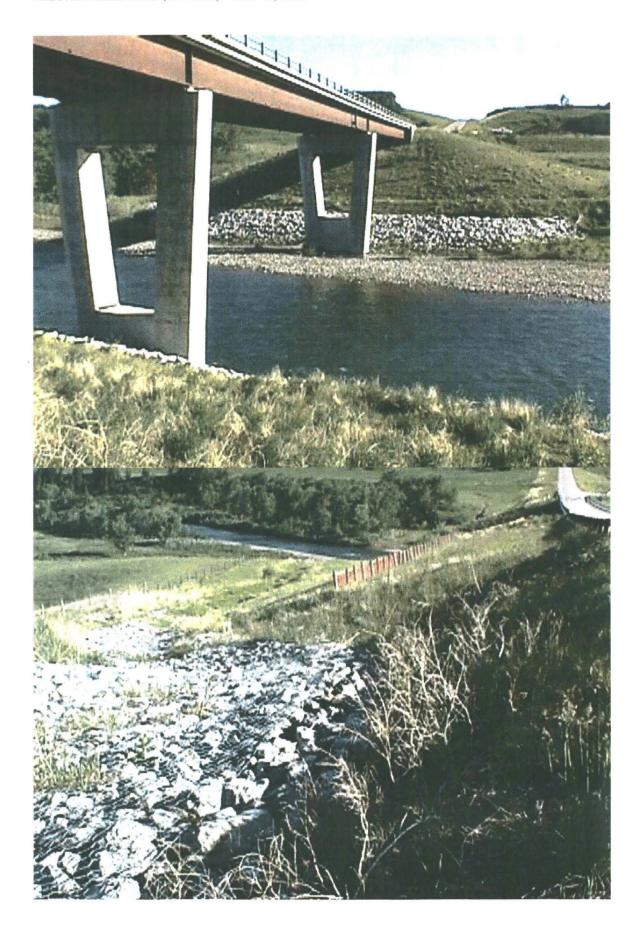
Looking south at south abutment. Note erosion protection works in west ditch of the abutment fill.
